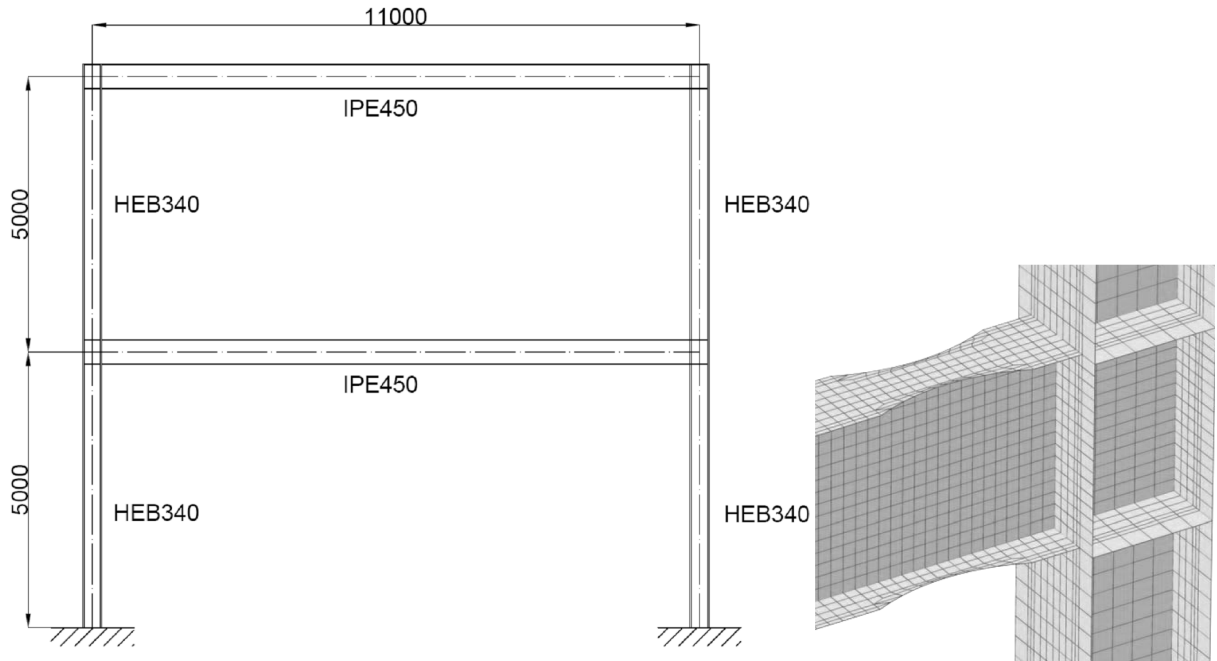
Structure of study with dimensions in mm (left) and view of the beam-to-column connection (right)
